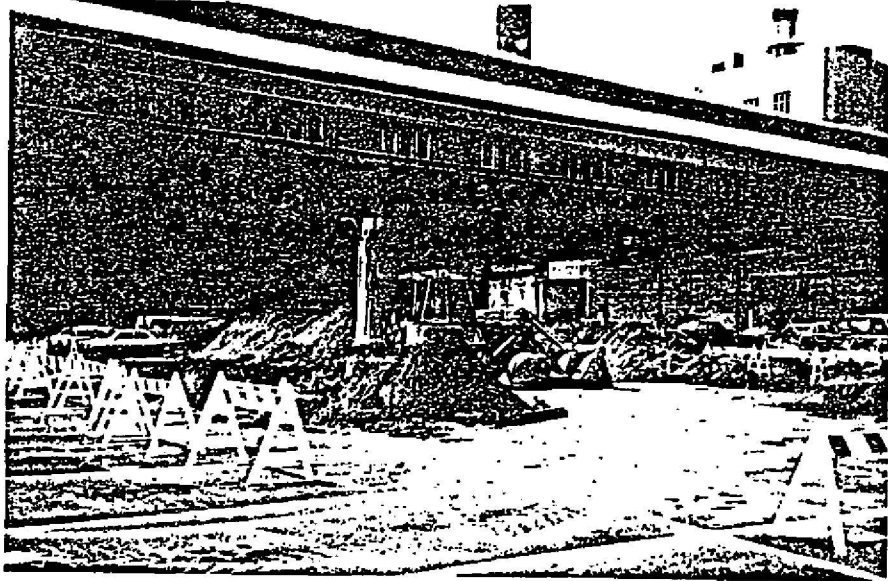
View of the project area looking southwest, showing backhoe beginning excavation of basement fill.
